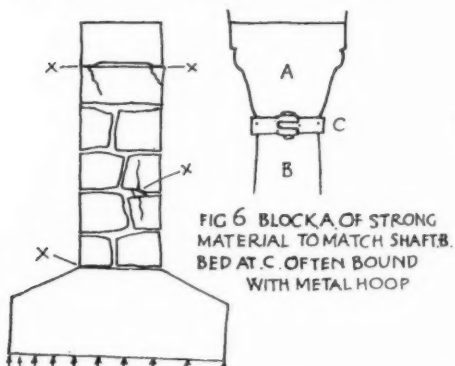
FAULTS (X) IN BUILDING PIER. ECCENTRICITY SET UP BY POOR FOUNDATION AND BAD BEDDING
